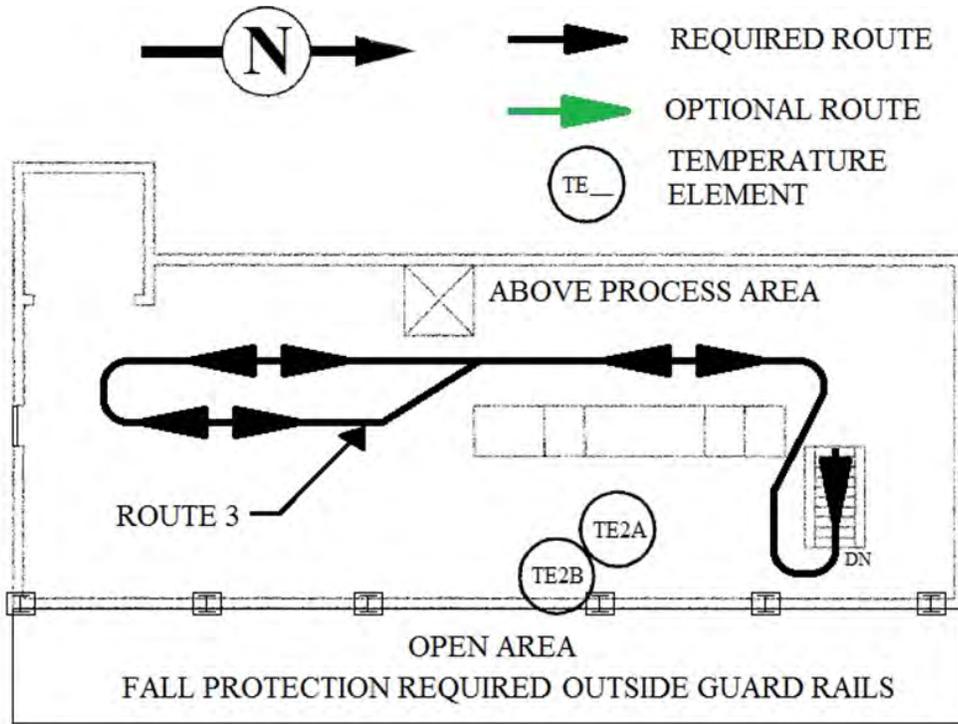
105-DR Safe Storage Enclosure Floor Plan Elevation 56 ft - 4 in.
